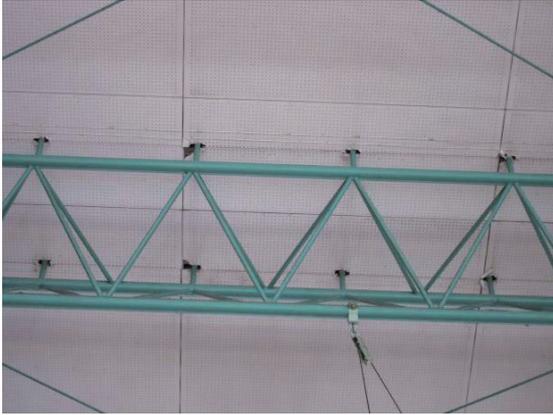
Damage to metal furring suspended ceiling at the connection
